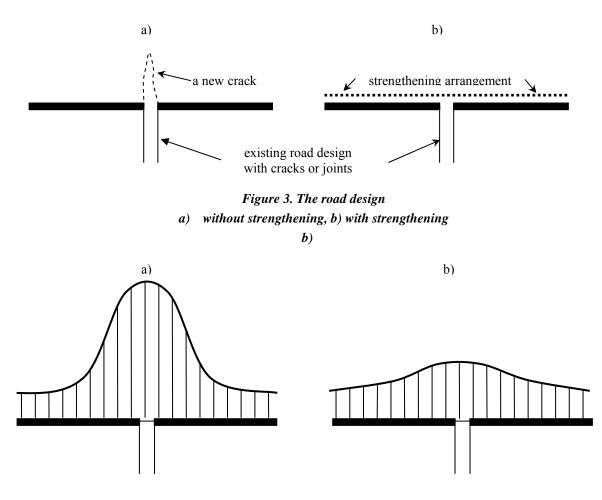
Horizontal pressure at stretching in asphalt a) without strengthening, b) with strengthening
